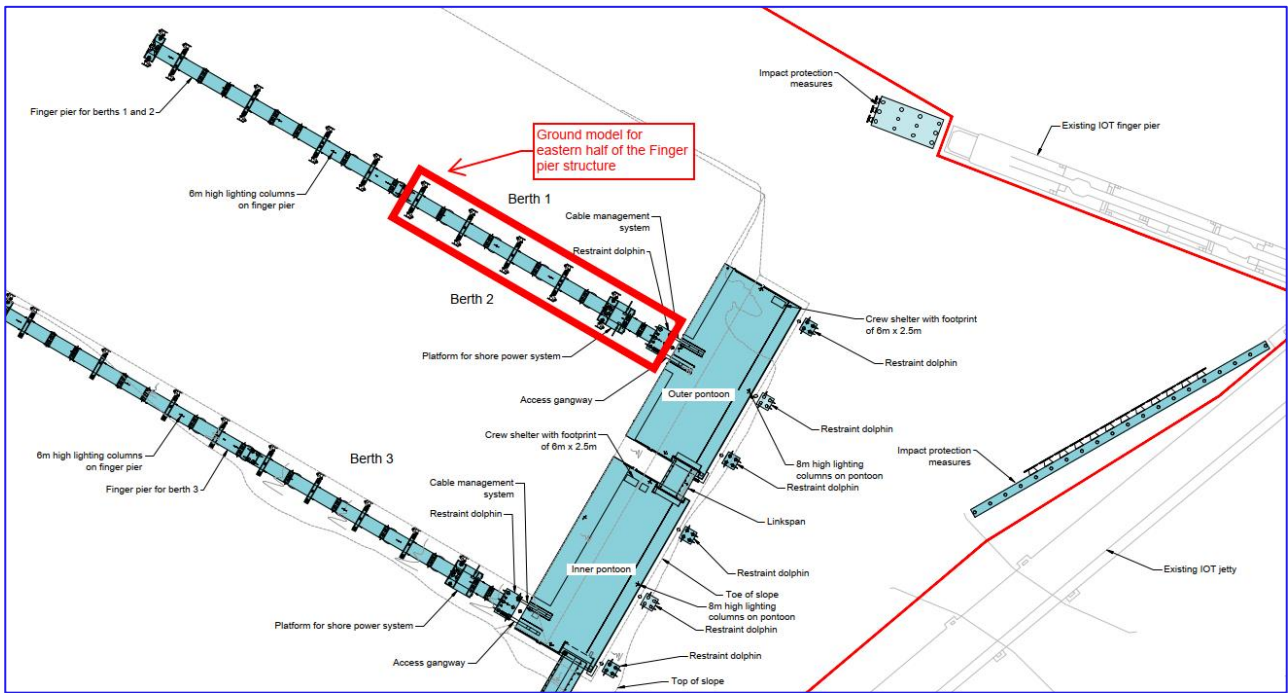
Plan view of IERRT indicating area of adopted ground model.
